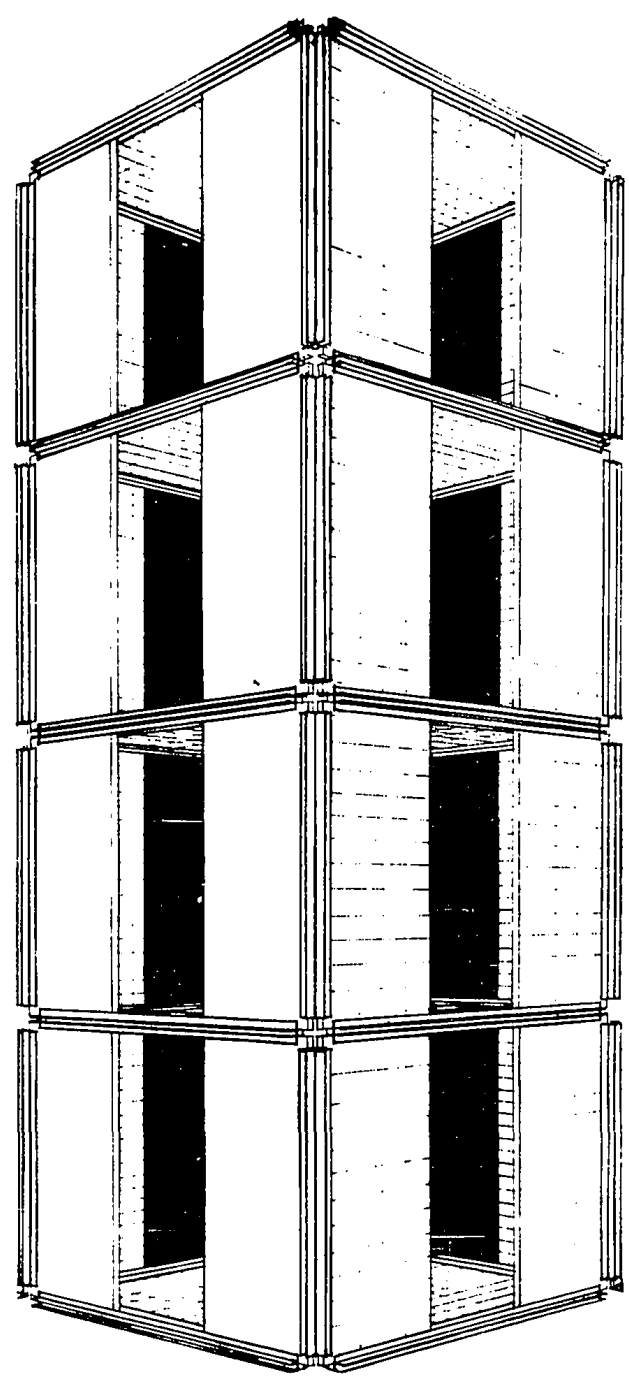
PERSPECTIVE VIEW OF PANELIZED BUILDING
